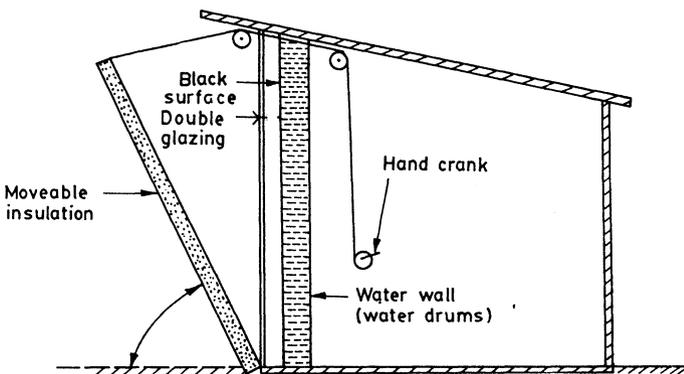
WATER WALL (DRUM WALL) TYPE PASSIVE SOLAR HEATING SYSTEM
